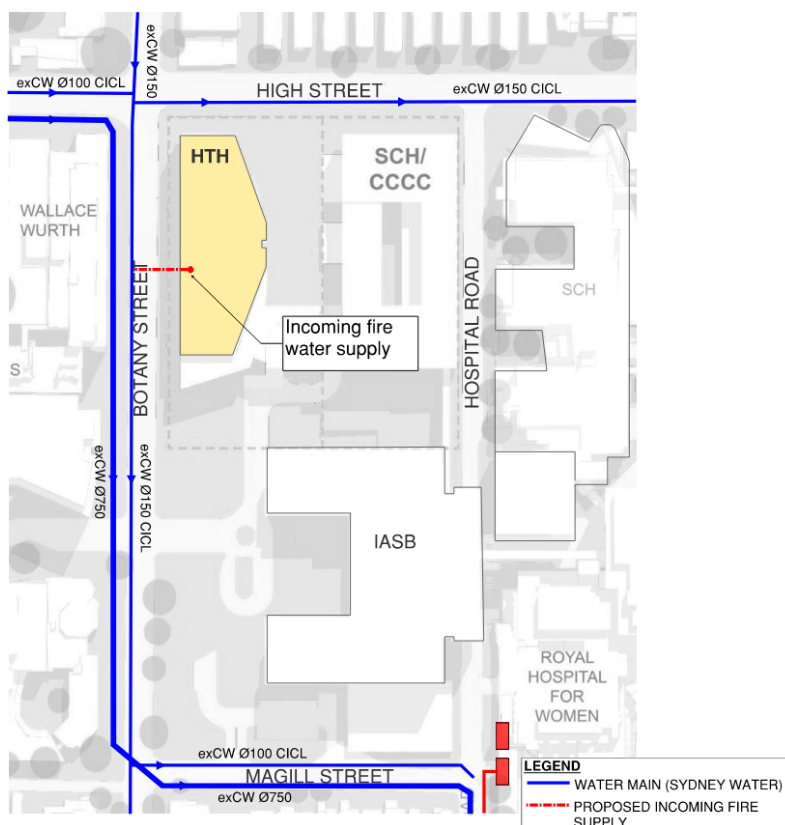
Authorities Water Mains – Proposed Fire Connection
